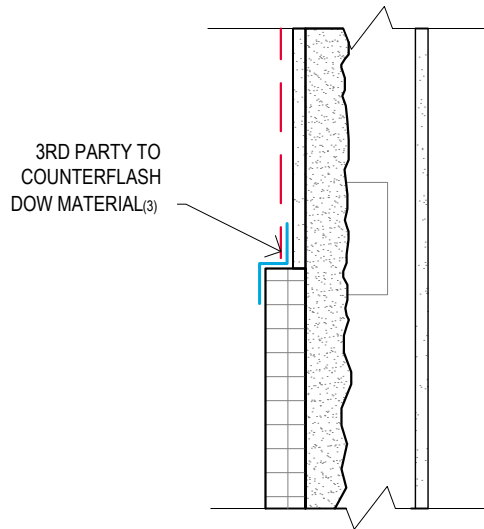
VERTICAL TRANSITION OF OTHER WRB TO THERMAX | SECTION
